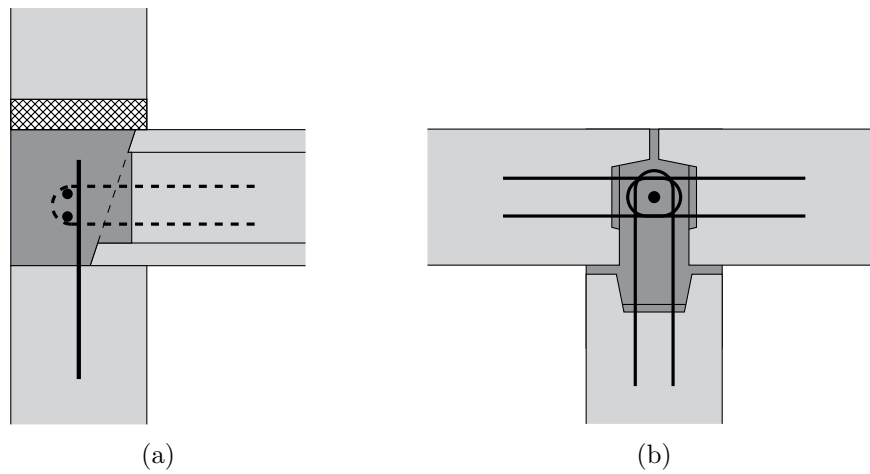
a) Vertical section of slab-to-panel joint reinforced with U-bar loops and embedded rebars. b) Horizontal section of panel-to-panel T-joint reinforced with U-bar loops extruding from all three panels.
